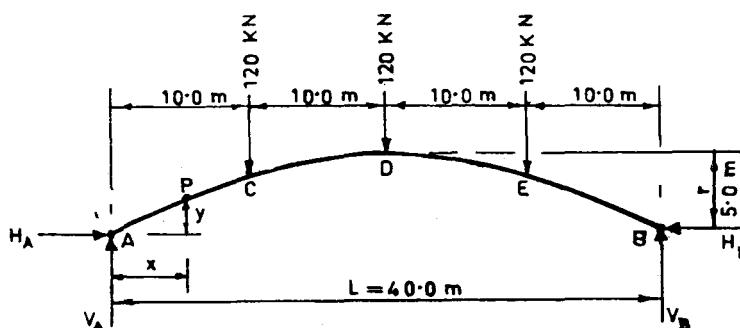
DETAILS OF ARCH (Example 13.2 )
